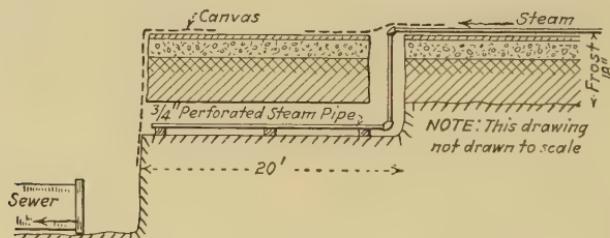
Thaw-pipe in under-crust tunnel for trench cut.
